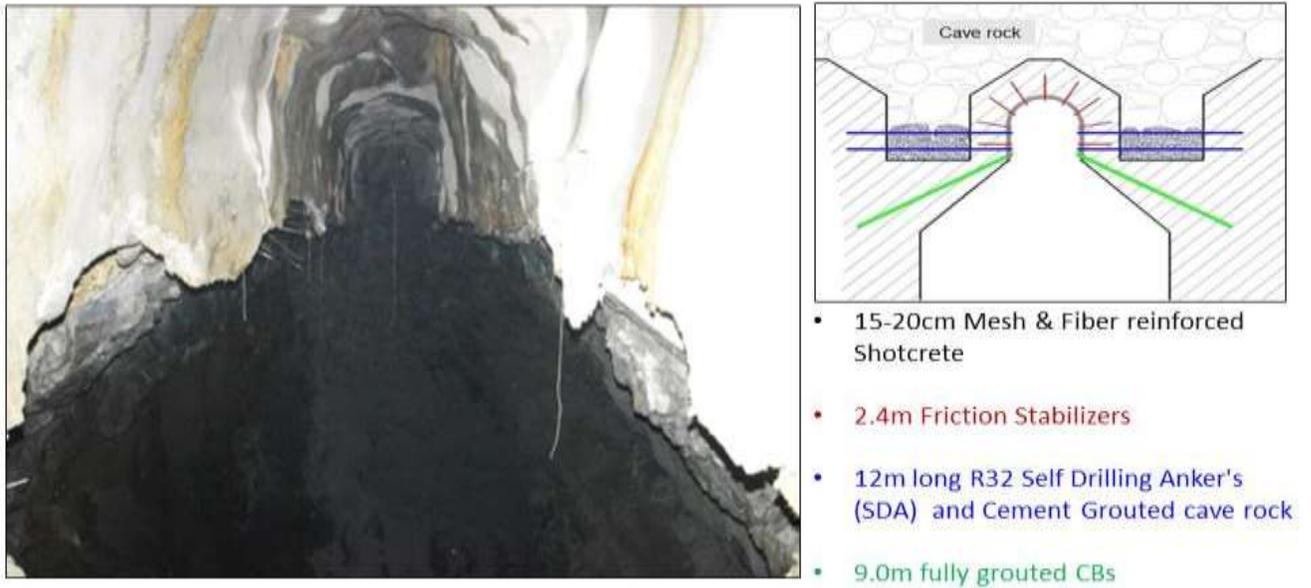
Photo of open stope 11a, with a cross section of SLC zone floor support and open-stope roof support regimes in place.
